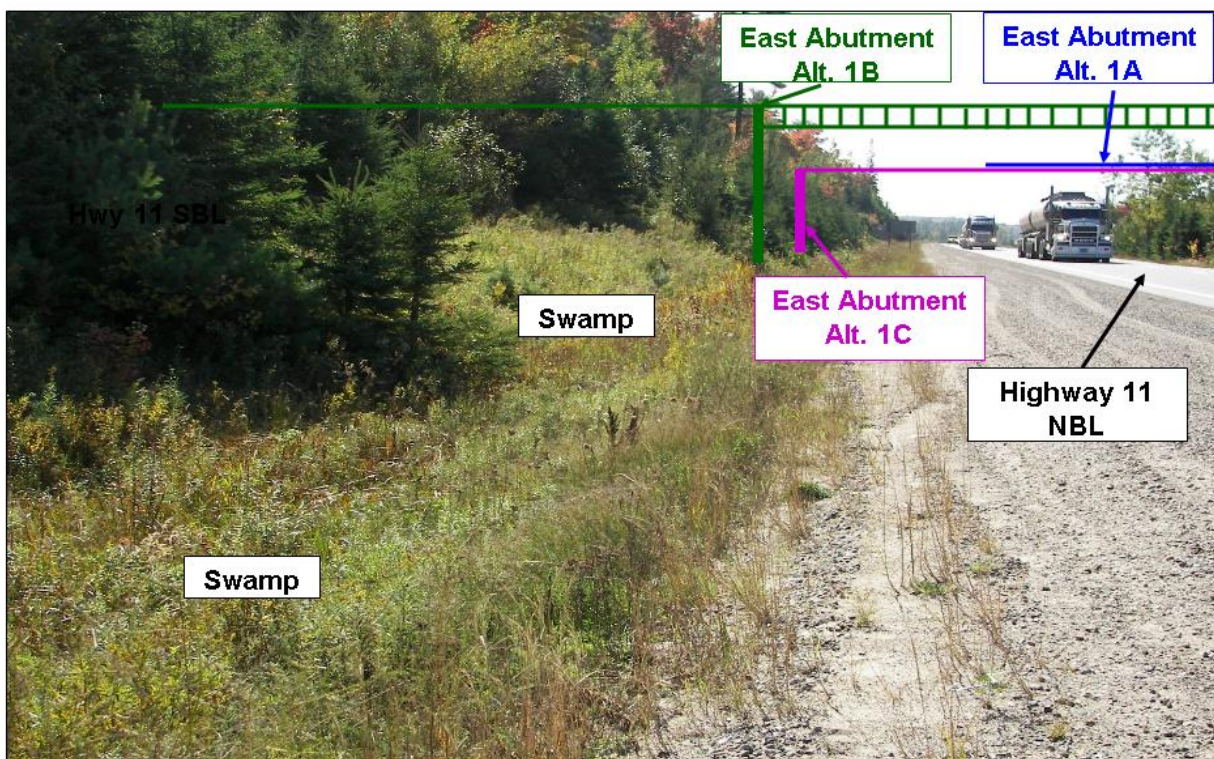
VIEW: Looking northeasterly from west shoulder of Highway 11 SBL at pier and east abutment locations of I/C underpass at Sta. 20+300. (Sept. 26, 2008)
